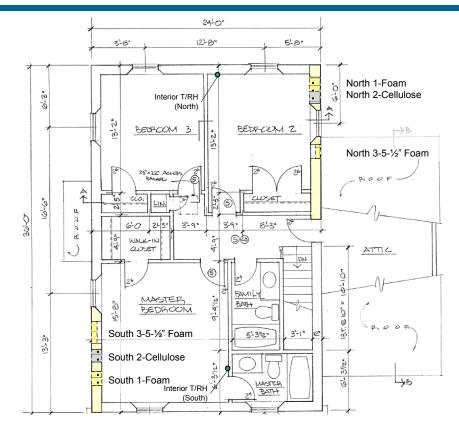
Test walls shown on second-floor plan, with guard bay insulation for separation
